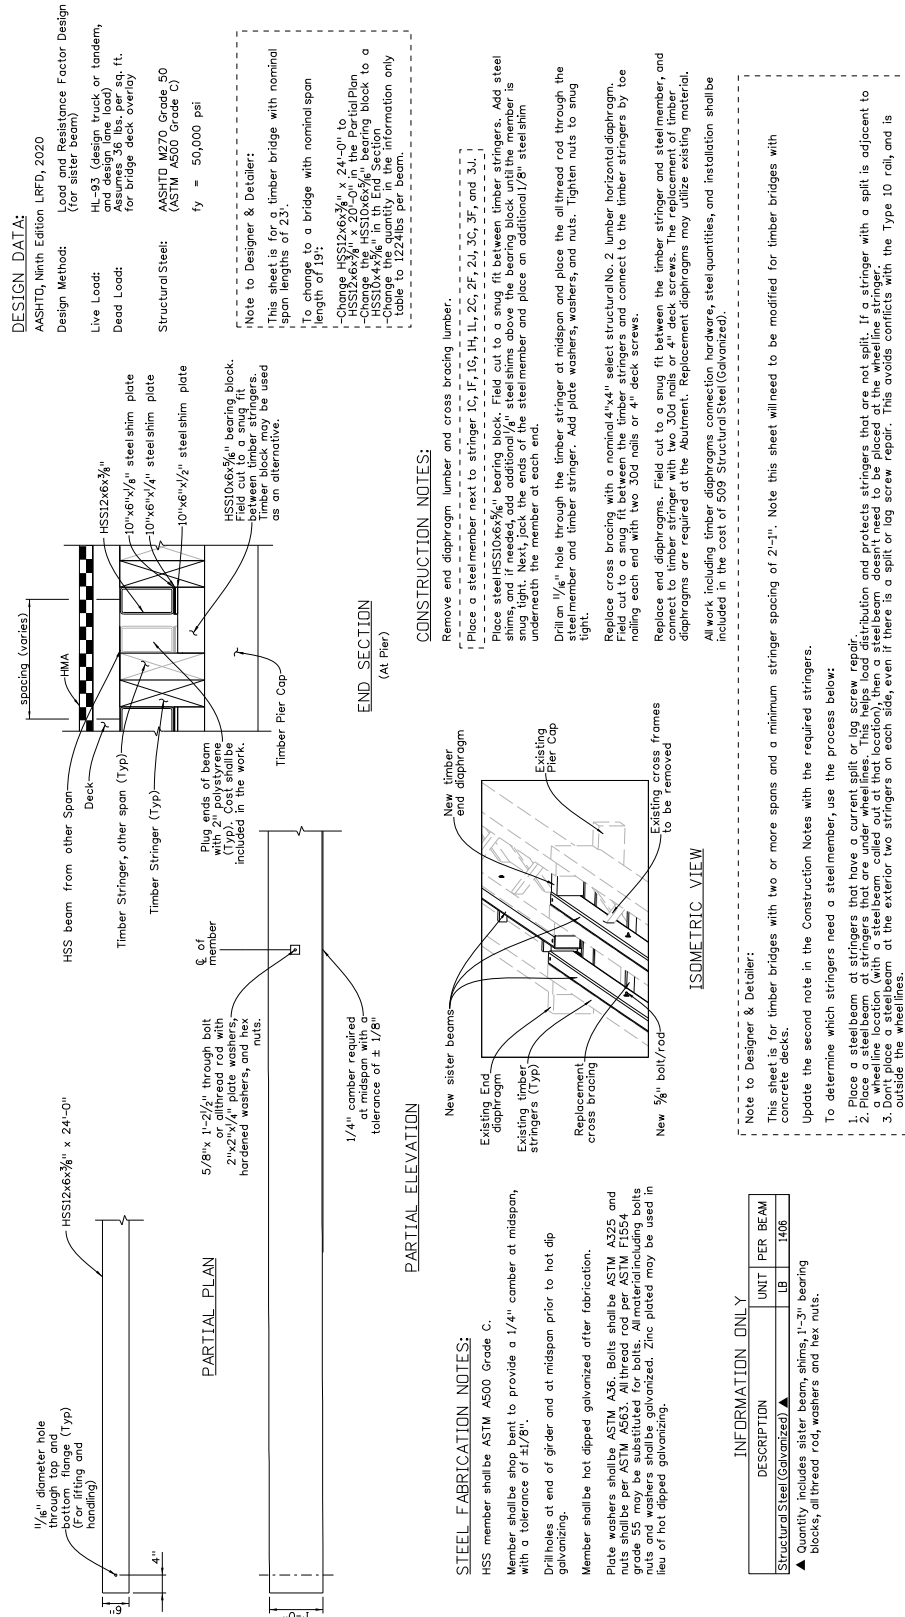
(H)-1 Current worksheet for Timber Girder repaired with Steel Sister Beam
